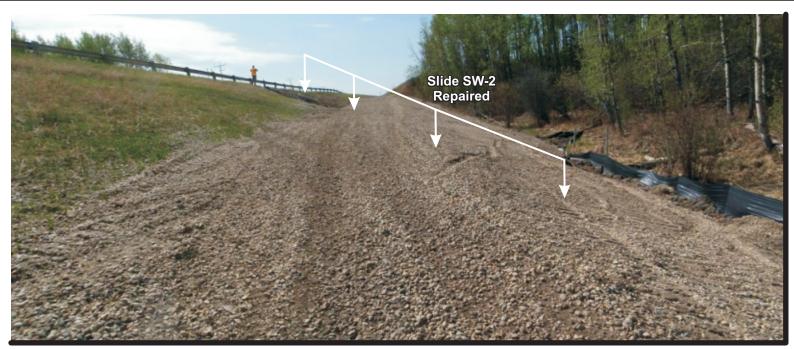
Looking south along west ditch SW-2 along sideslope SW-3 along verge of valley wall
